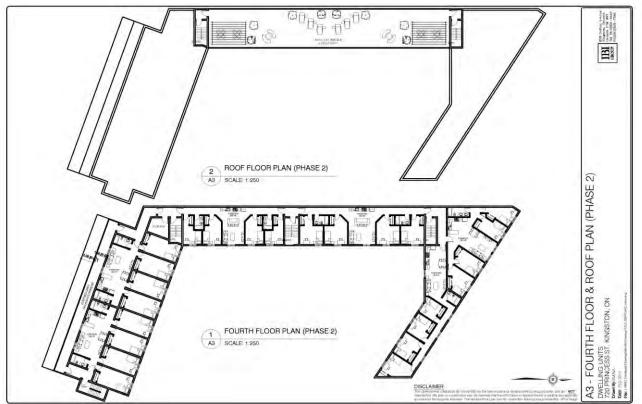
Fourth Floor and Roof Plans (Phase 2)
